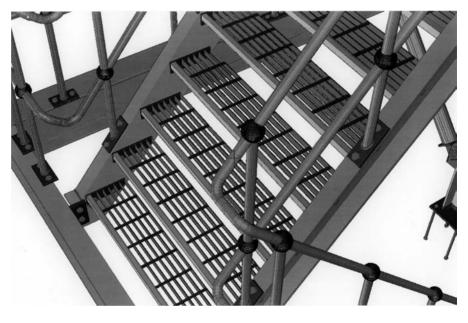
Solid modelling of typical steel stairs (Strucad, Derby, UK)
